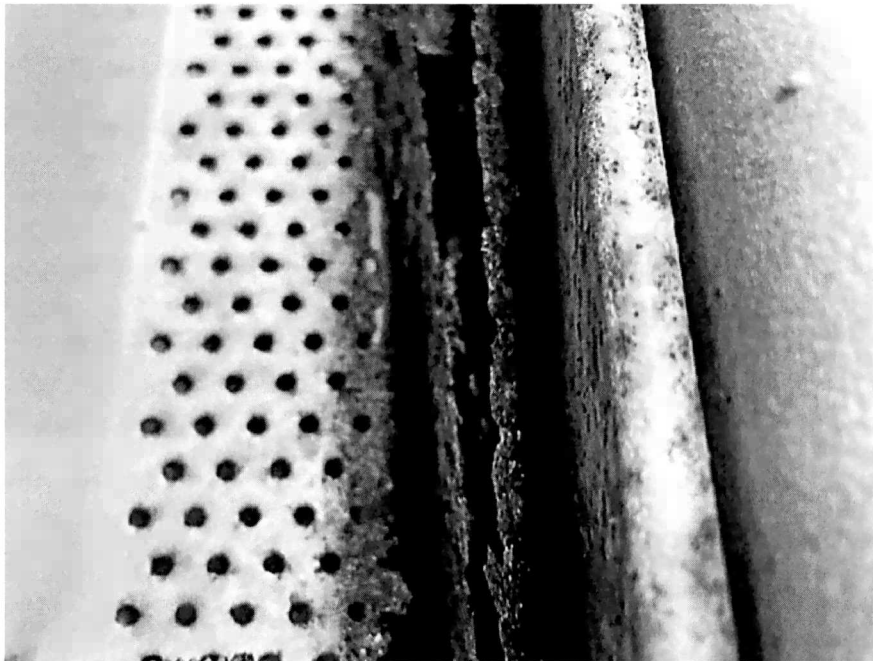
Severely damaged roof deck side-seam near north-west wall
